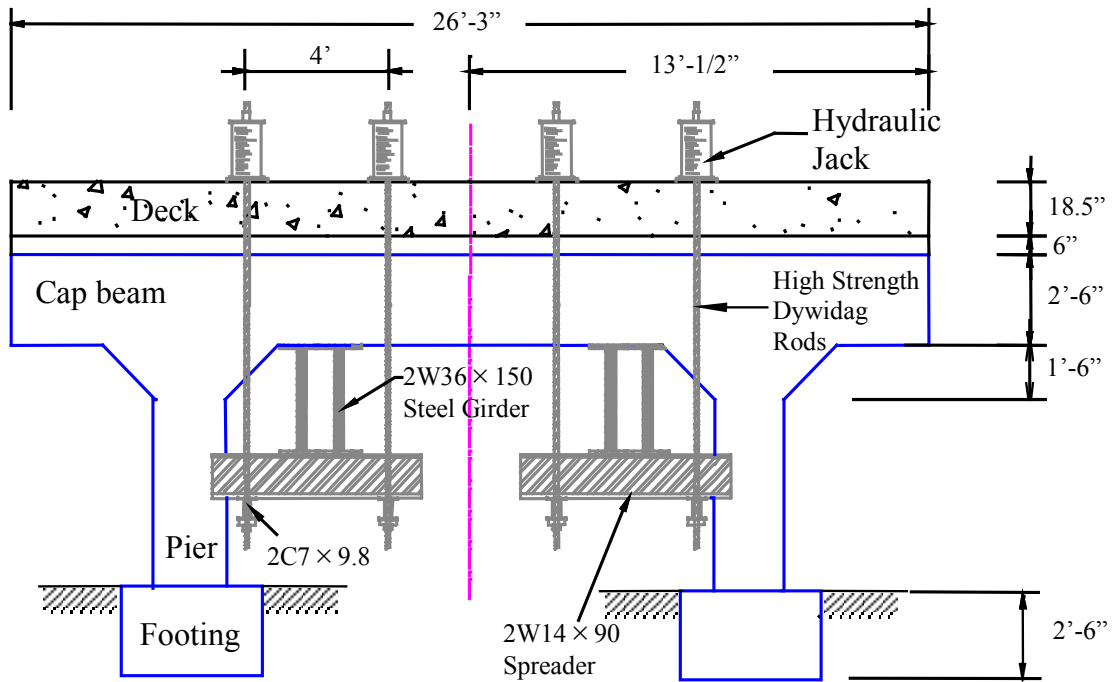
illustrates a plan of the test setup for the middle deck (deck 2). This configuration was also used to test decks 1 and 3 with simple modification to produce the end reaction at the abutment. The loading system comprised of an electric pump, four hydraulic jacks, and control valves. Hoses connected the jacks in parallel so that equal pressure was achieved in the jacks.
